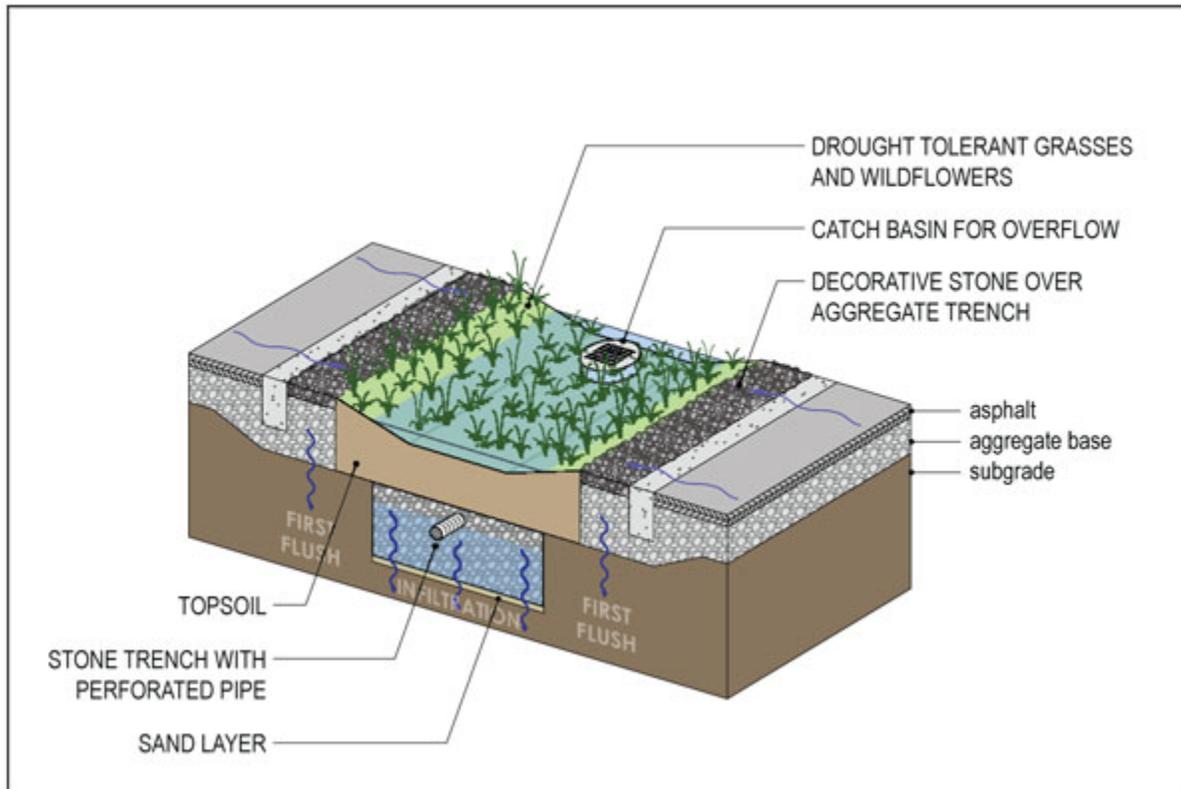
A cross section of a traditional bioswale. A subdrain is included under the topsoil layer to drain excess runoff into a storm sewer system.
